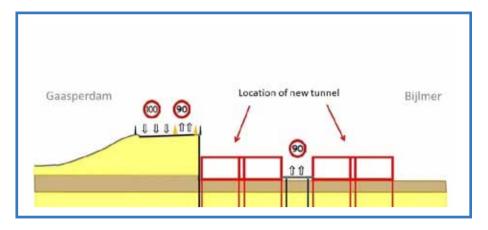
Construction proposal for the Gaasperdammer Tunnel (Illustration: IXAS)
